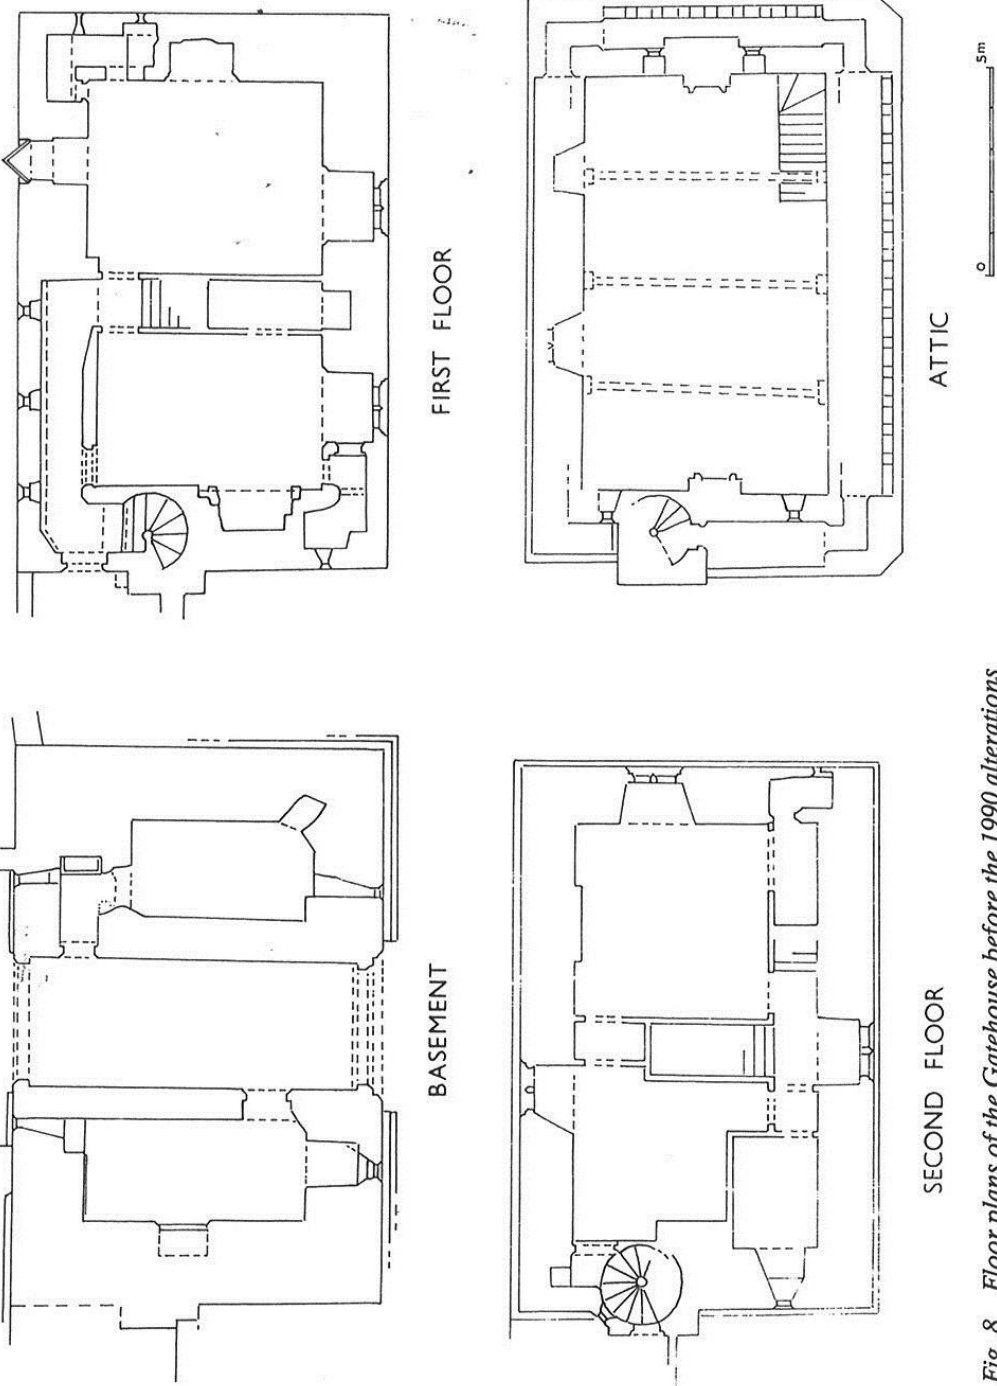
Floor plans of the Gatehouse before the 1990 alterations
